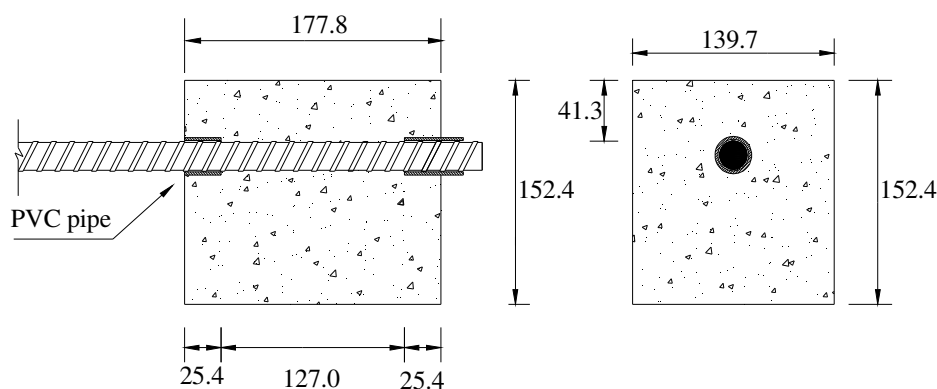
Pull-out test specimen dimensions (unit: mm).
